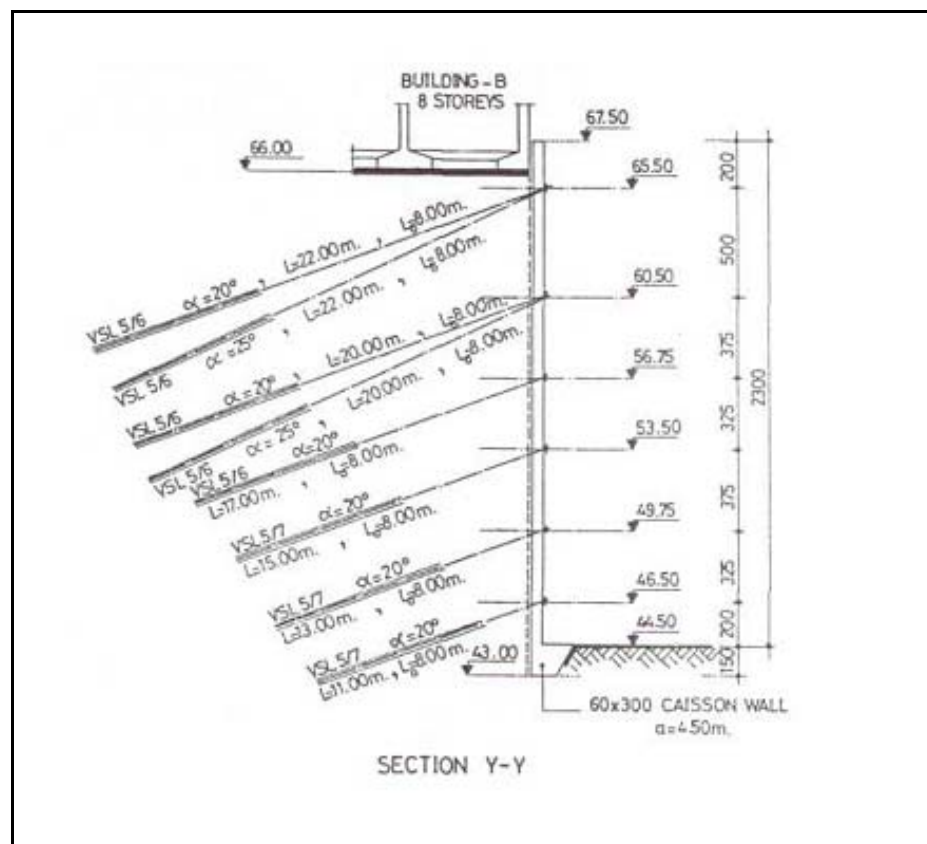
Cast in-situ manually dug caisson wall with pre-stressed anchor application for the deep excavation of Park Hotel (Candogan and Saglamer, 1991)
